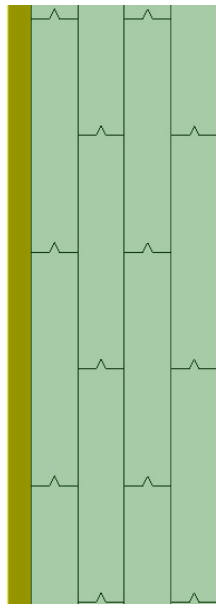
Insulation section showing the VIPs proposed spatial configuration (on left the inner wall and on the right the outer one) (SC 01)
